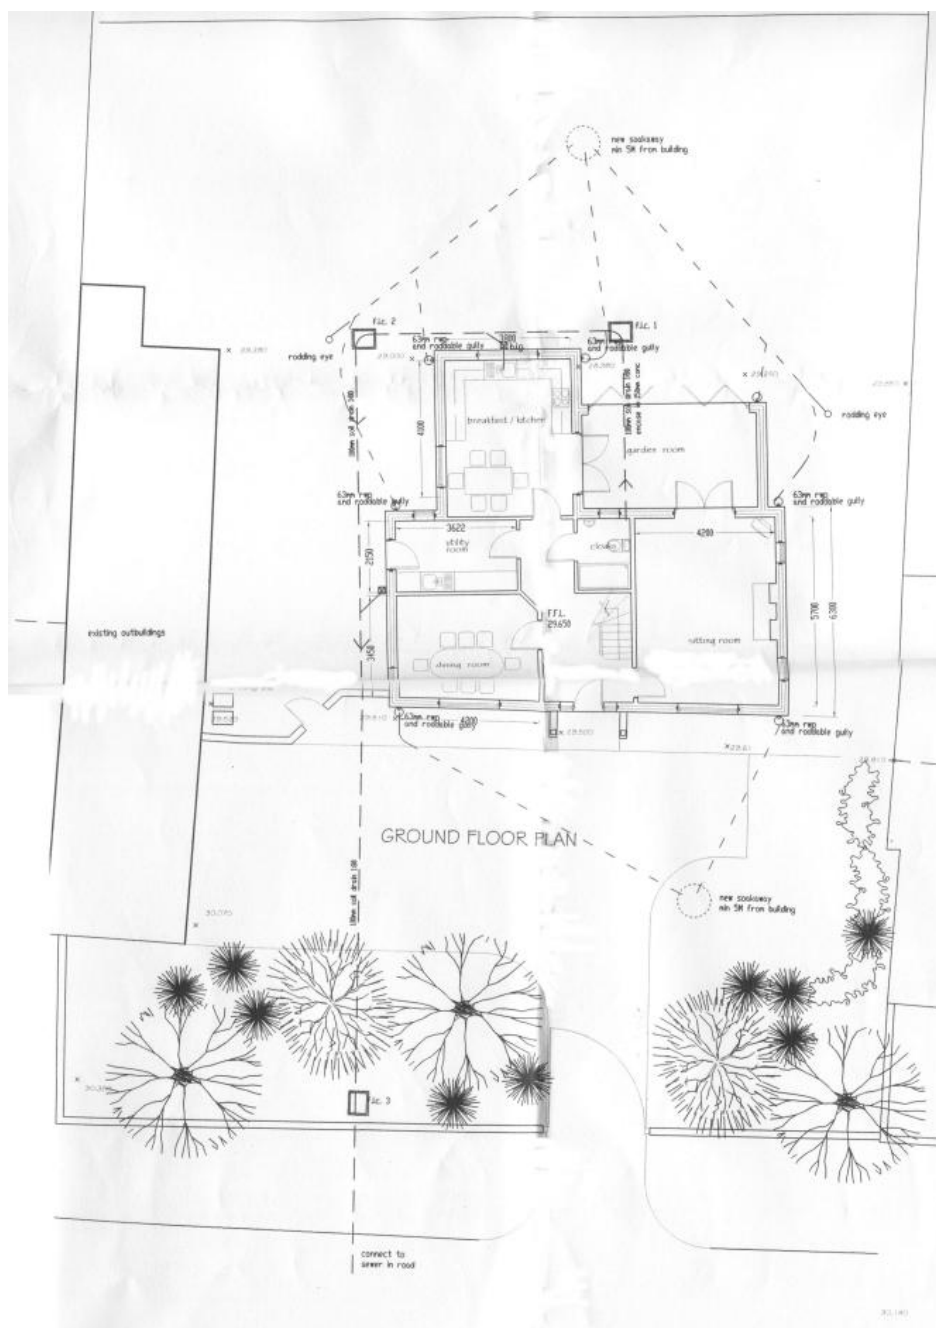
Plan of proposed development. Plan provided by developer. Scale 1: 2500
